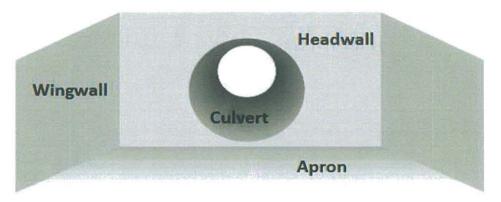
Typical Culvert End Arrangements – Pipe Culverts
